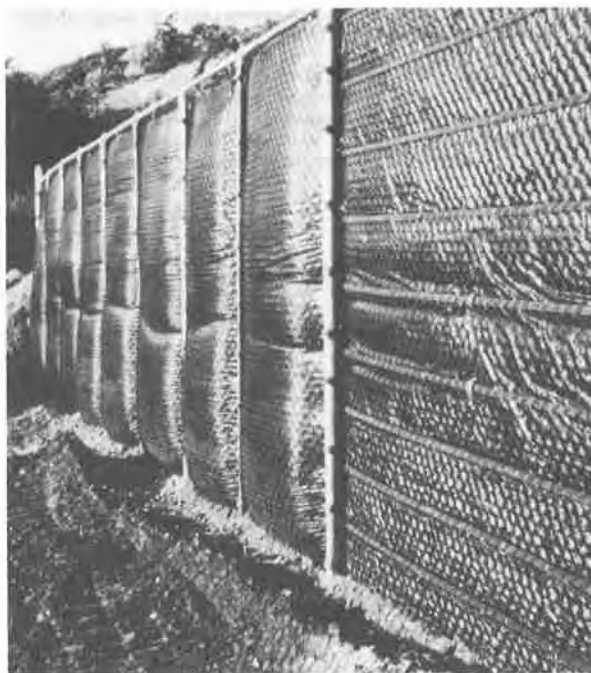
FABRIC FACING, TEST WALL NO. 3
